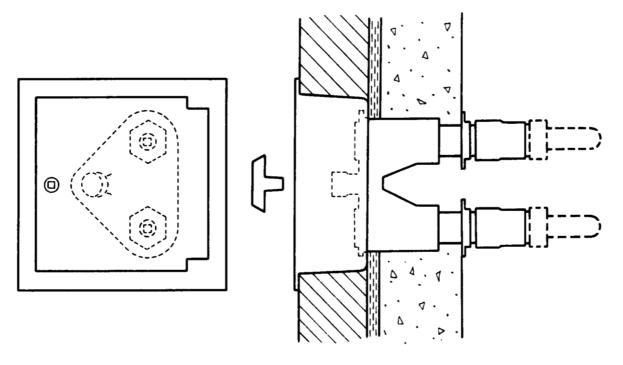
D RECOMMENDED INSTALLATION (PLAN VIEW) WITH VALVE BEHIND BUILDING WALL IN HEATED AREA TO PREVENT FREEZING
